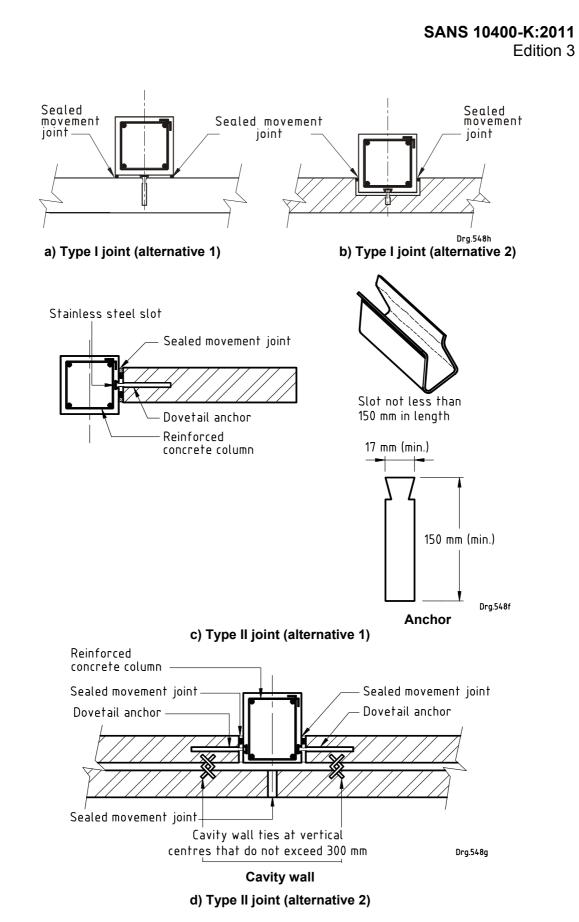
Movements joints between masonry walling and concrete columns using dovetail slot anchors (type I and type II joints)
